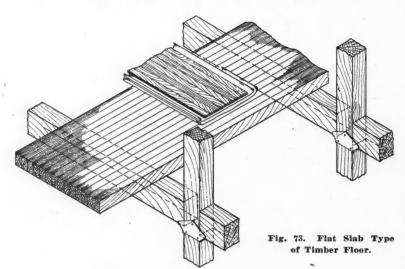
This floor is supported by the main girders as in the previous case, but is intended for use with long spans or heavy floor loads. The floor may be made up by laying on edge planks 2 inches or 3 inches thick and from 6 inches to 8 inches wide. Each plank is securely spiked to its neighbor when it is laid and helps to build up a solid timber floor slab. The edges of the planks are surfaced and given a slight bevel on each side. This bevel provides a finish to the under side of the floor where this surface is to form the ceiling of the room below. Care should be taken to see that the planks are spiked in such a way as to prevent cracks between the planks. This will prevent dirt from passing from one floor to the other, and also provides a better fire-resisting surface.
